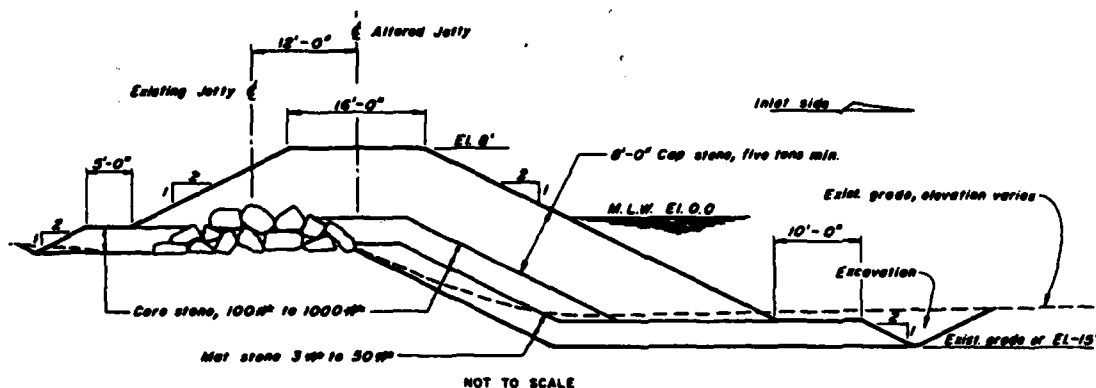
Typical jetty section, Barnegat Inlet, New Jersey
